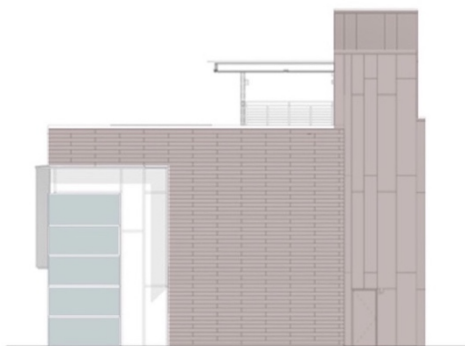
East Elevation. Reference: ArchDaily, edited by Author.
